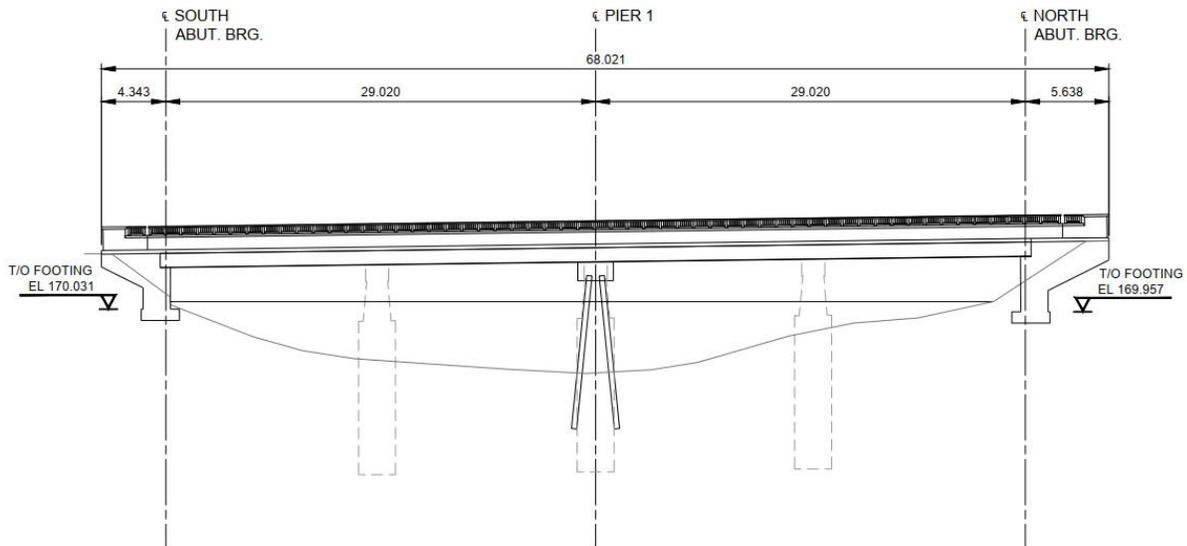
Proposed Elevation for Alternative Design Concept 1
